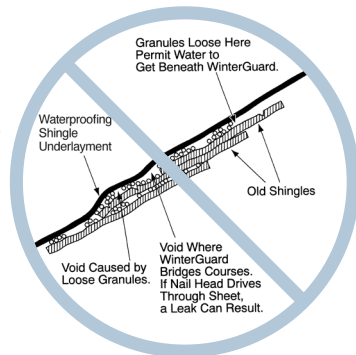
Problems with Waterproofing Shingle Underlayment application over old roof.
